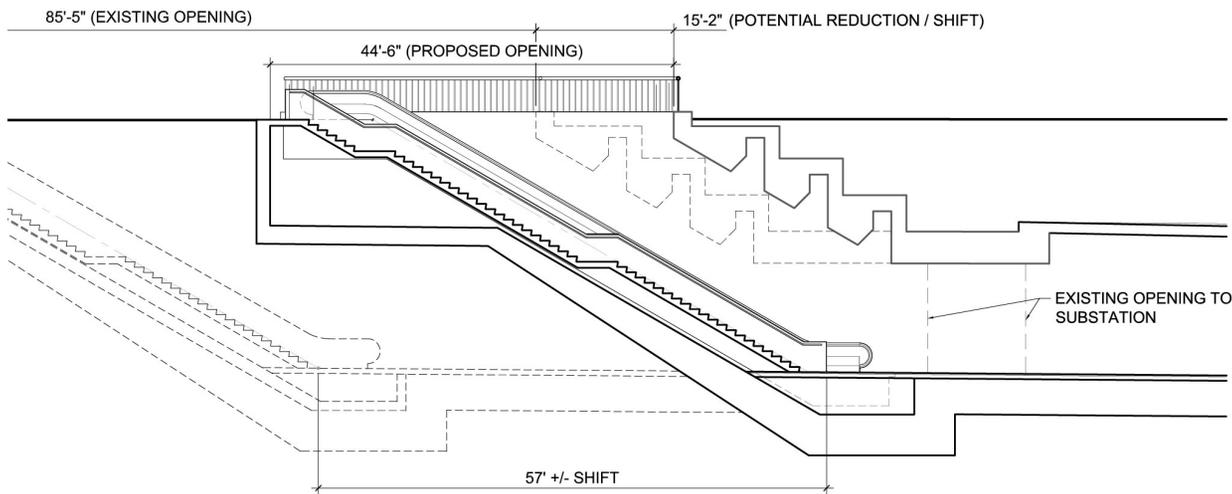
EXISTING UN PLAZA CIVIC CENTER ENTRY
